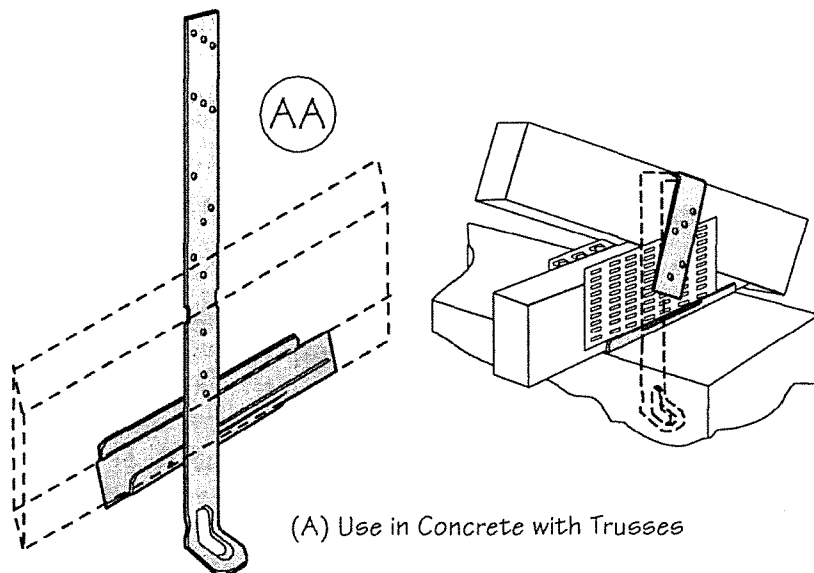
Typical Concrete/CMU Truss Connectors
